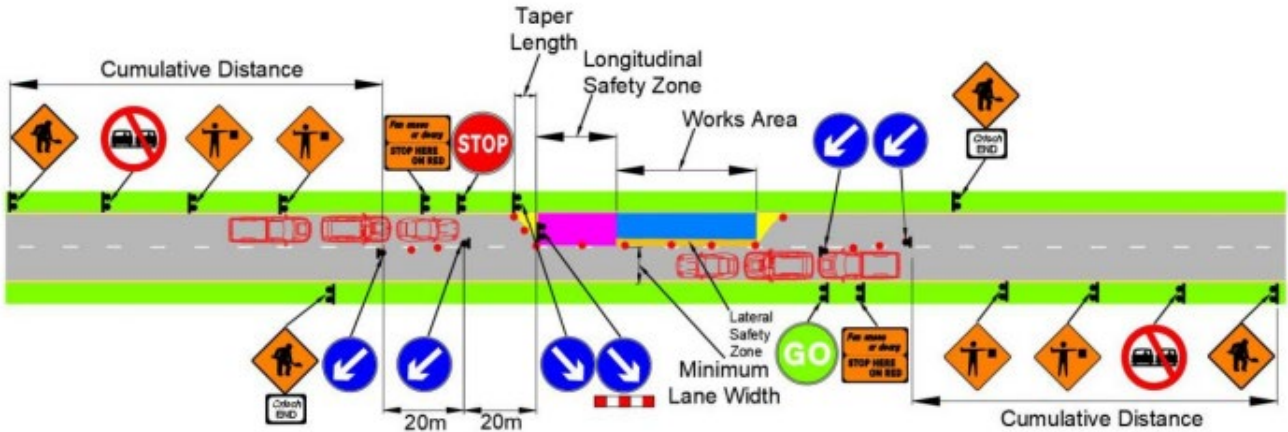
Stop and Go Traffic Control Signage for Single Carriageway Rural Road
